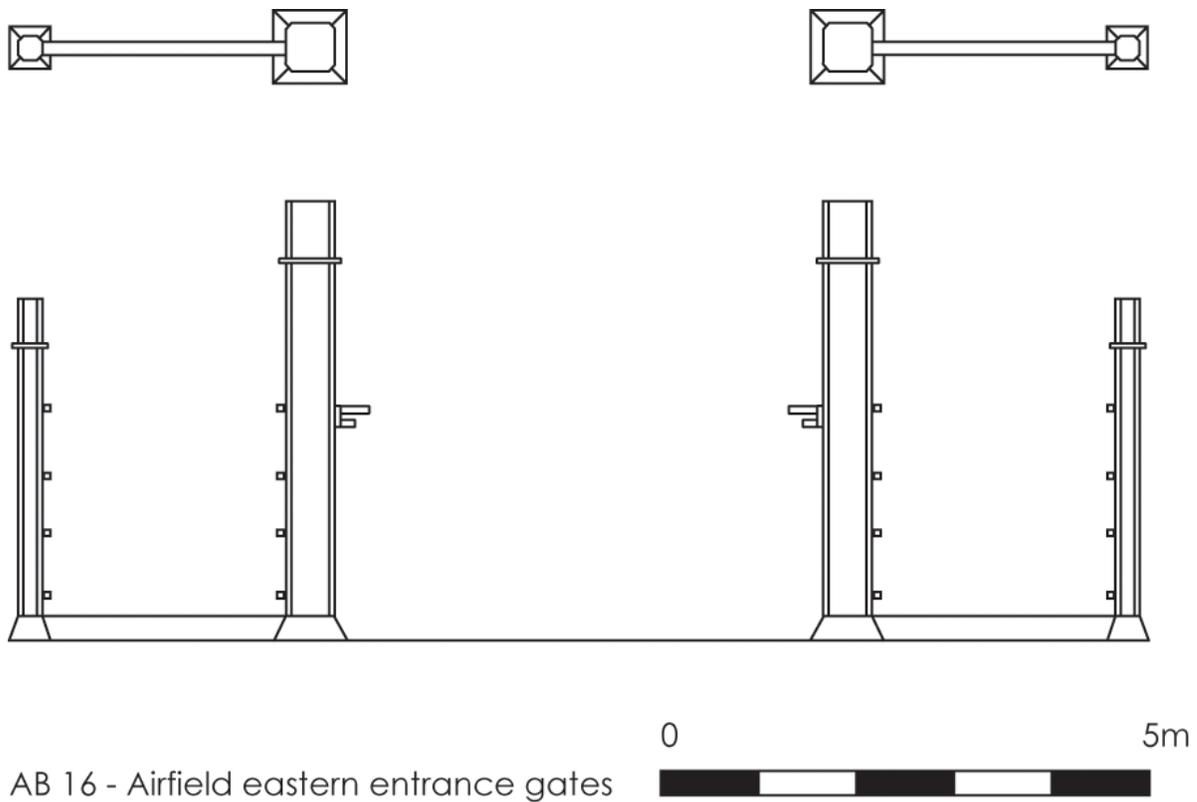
Plan view of concrete entrance gates at AB16. (drawing by Gavin Lindsay)
